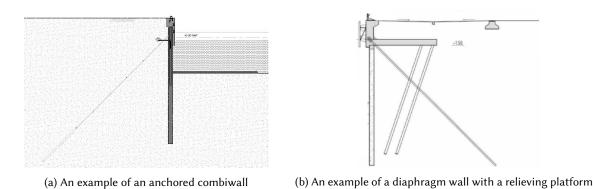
Two examples of basic quay wall designs. Source: PoR internal report, (De Gijt & Douairi, 2013)
